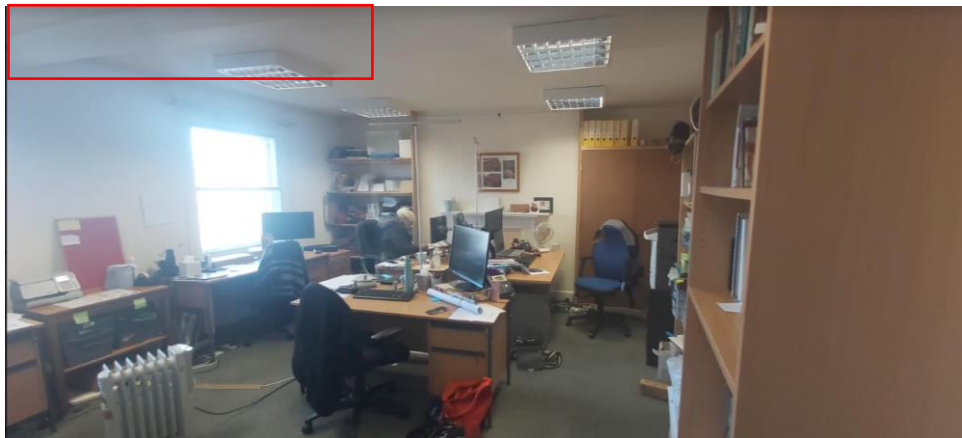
Missing wall to be replaced under down-stand and fireplace reinstated
